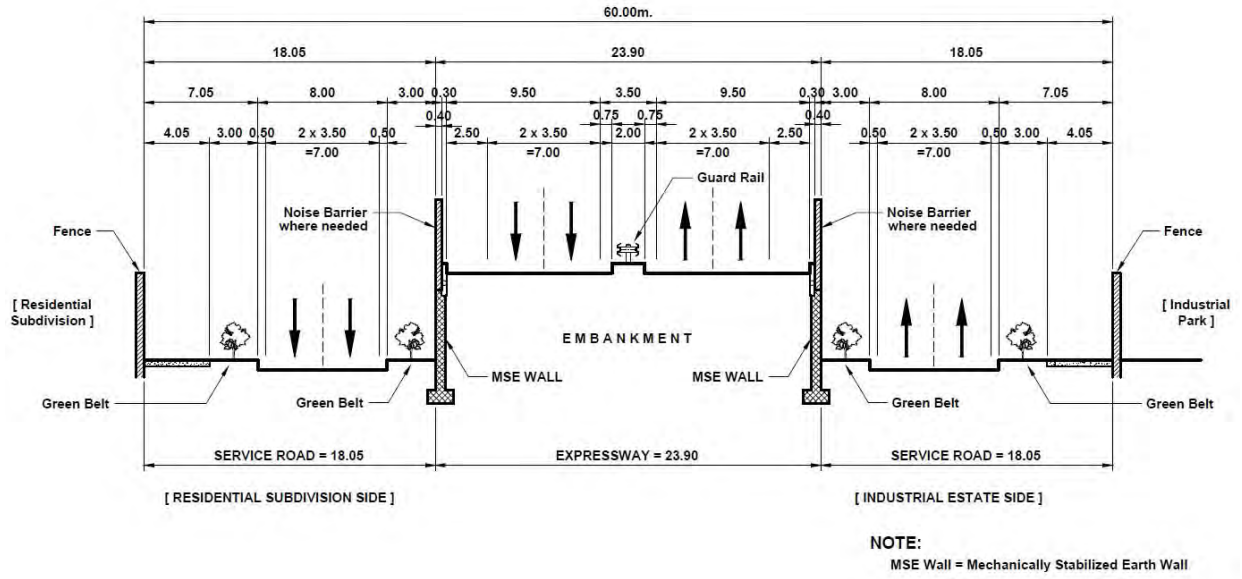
TYPICAL CROSS SECTION: MSE WALL SECTION
